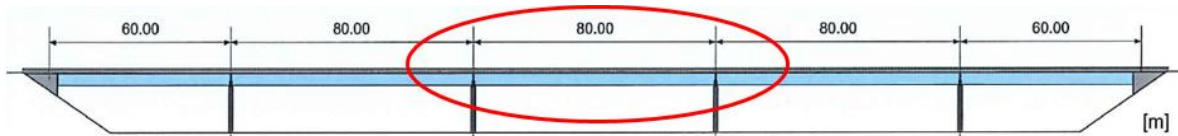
Inner span of the bridge considered for the design of the main girders (Pedro et al., 2017).
